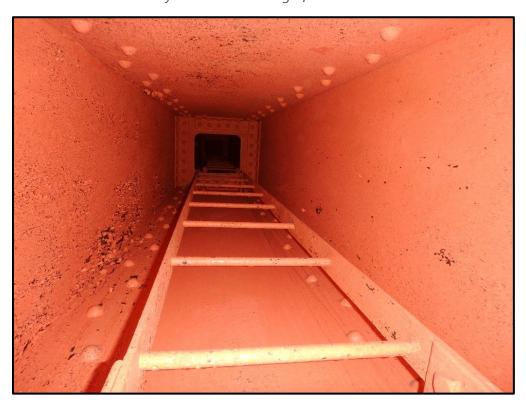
Typical Brittle and Peeling Orange Primer Paint in Tower Side Chambers. West Chamber at 7th Cell above Roadway Level in South Leg of Tower C shown.
